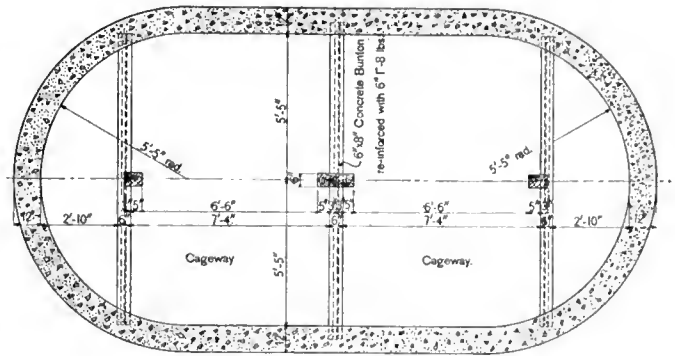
ELLIPTICAL CONCRETE HOISTING SHAFT, WITH H SECTION BUNTONS AND GUIDES
